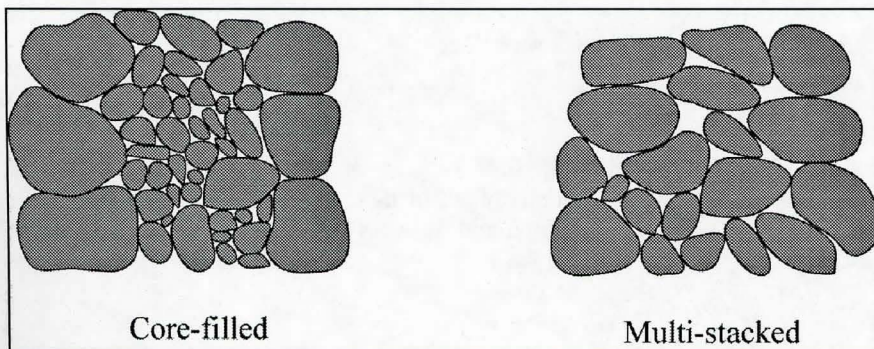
Examples of core-filled and multi-stacked stonework construction.
